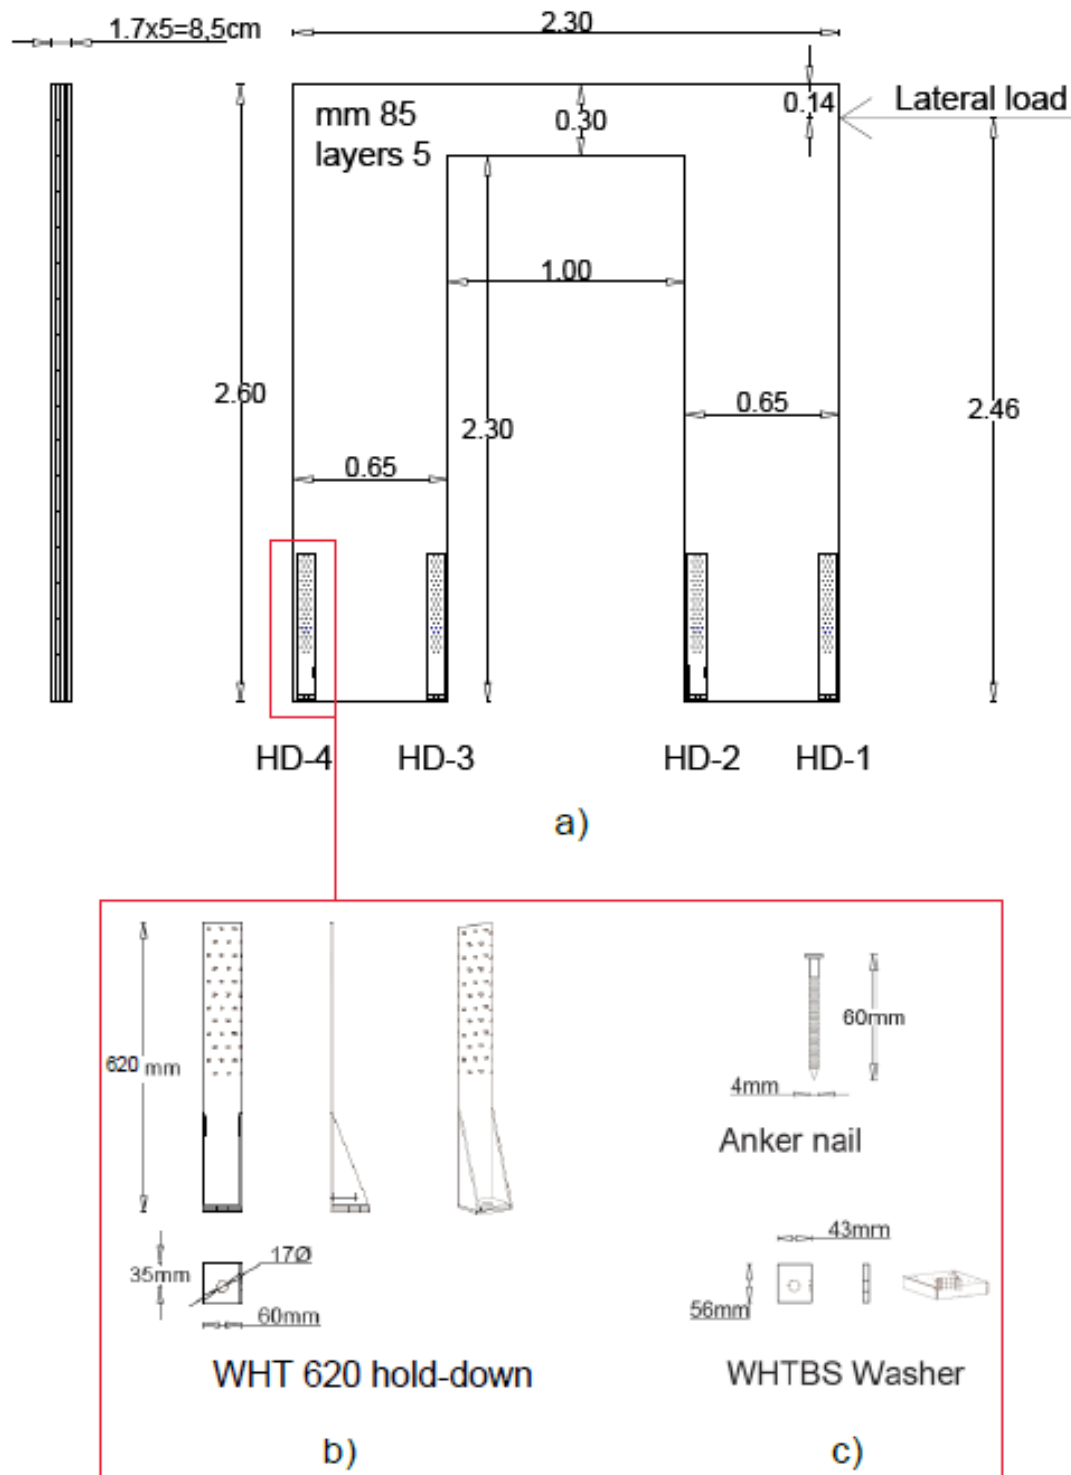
Detailing sketch of geometric configuration and connection system of shearwall 05
